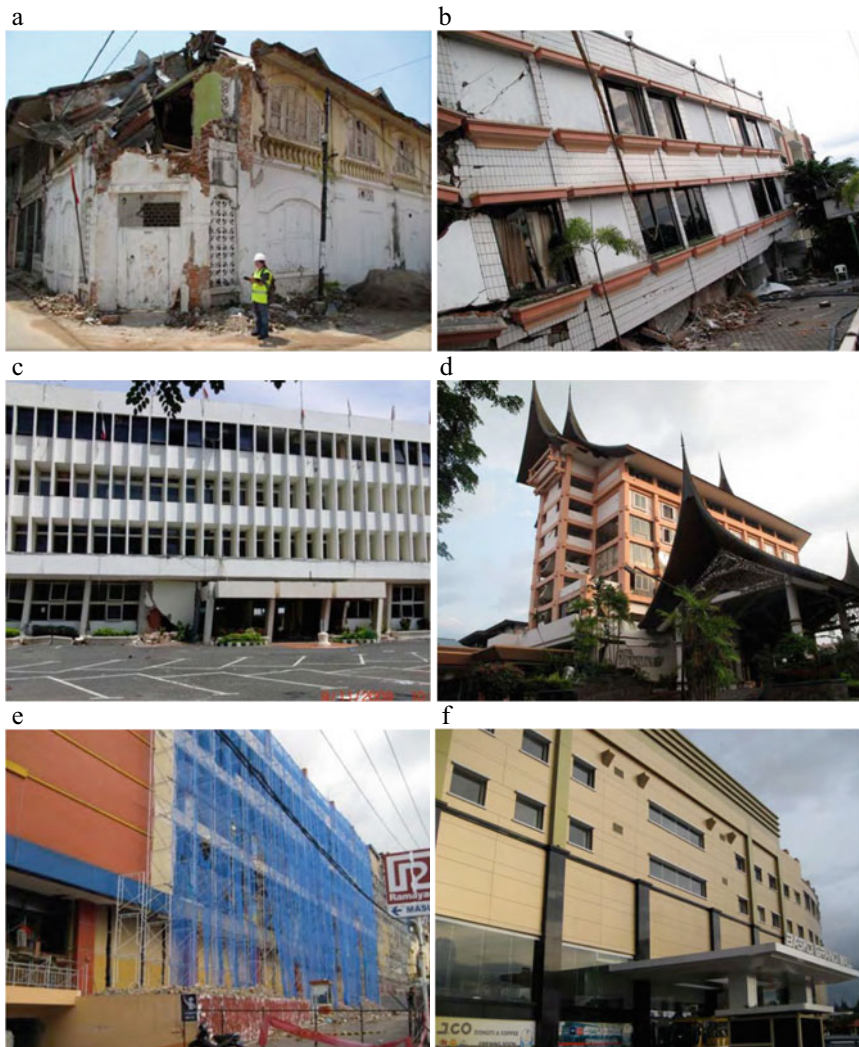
Structural performance of buildings in Padang city. a 1-storey masonry residential building, b 3-storey RC hotel building, c 4-storey RC commercial buildings, d multi-storey RC hotel building, e, f multi-storey shopping centres
